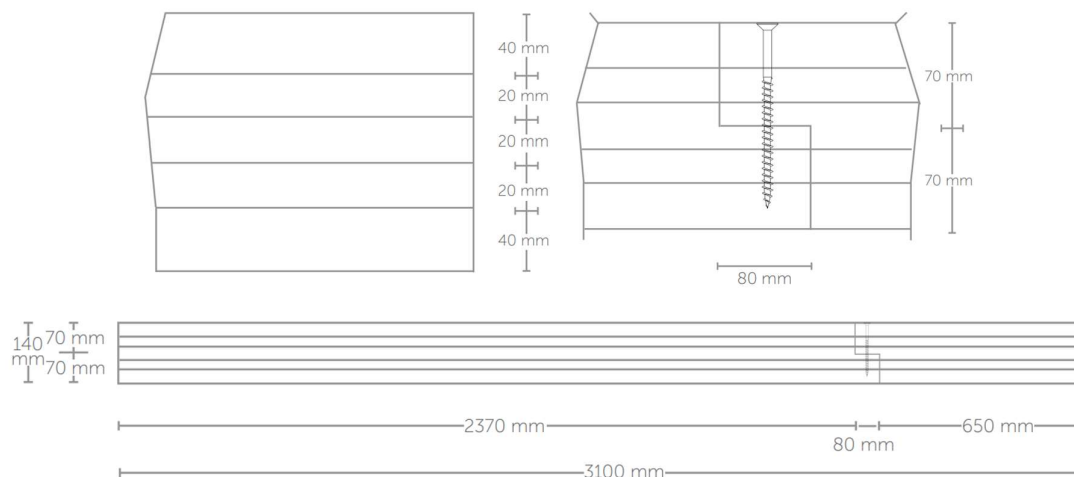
Layer structure of CLT 140 L5s and joint/screw detail and section of the slab.
